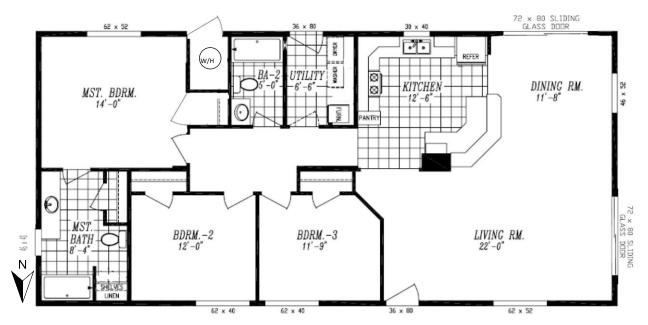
Floor Plan of the Lab Homes as Constructed
